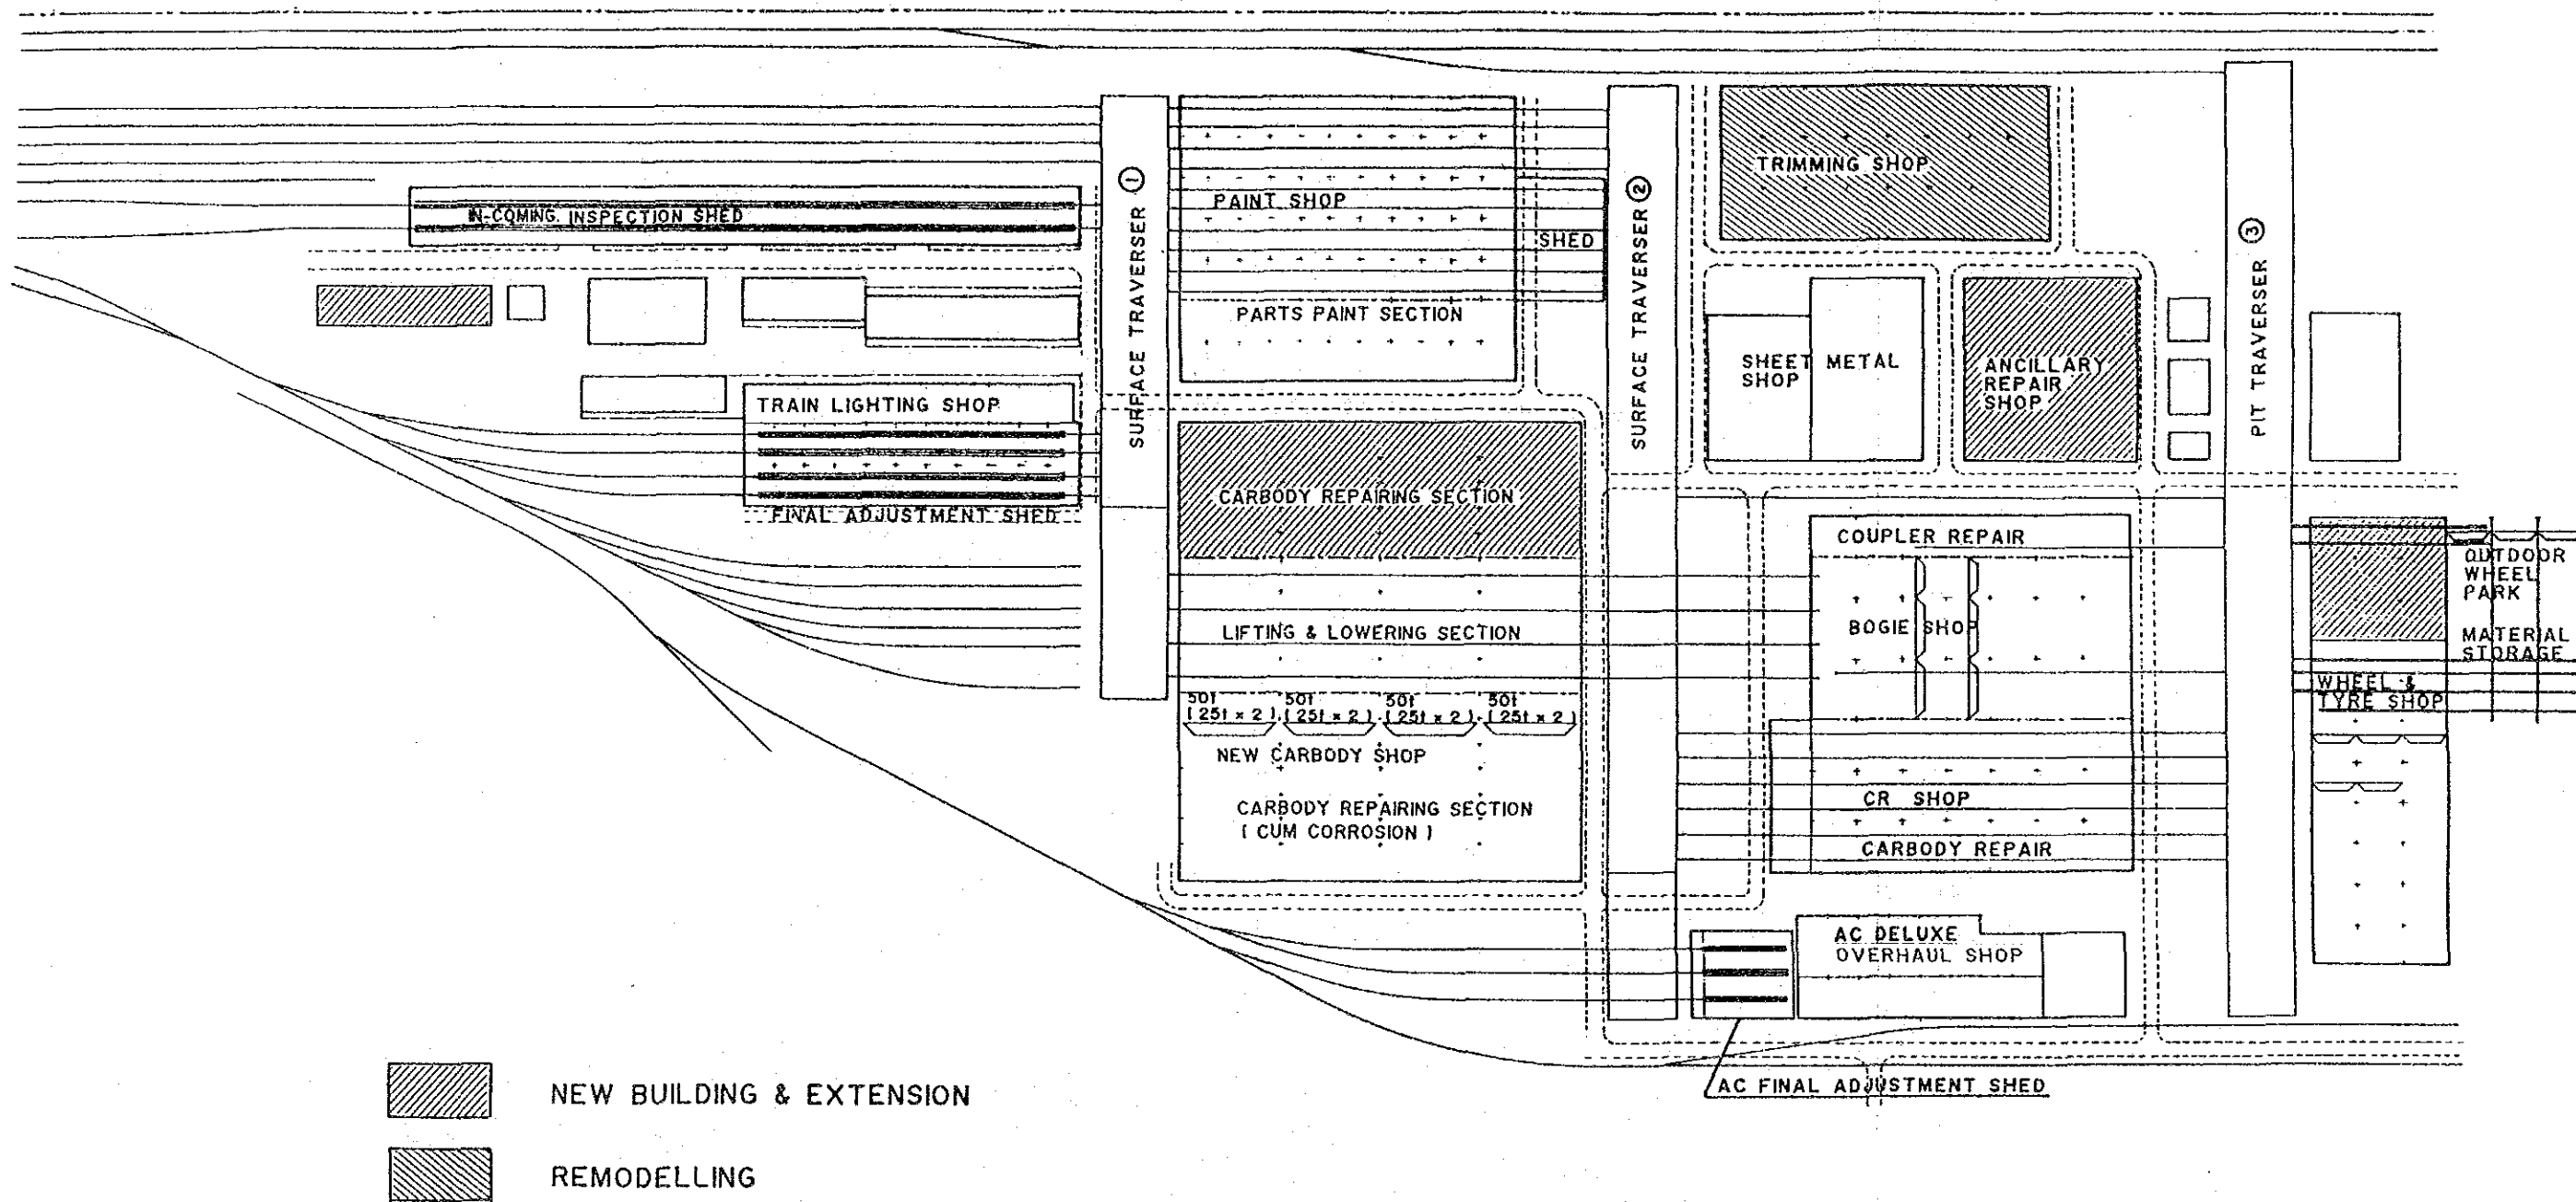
2. 6 LAYOUT PLAN OF CARRIAGE REPAIR AREA (PHASE II)
